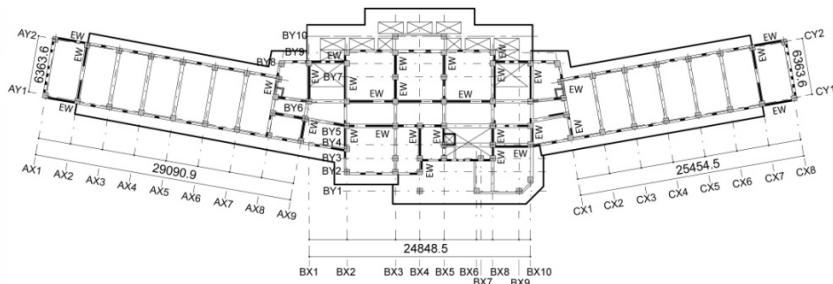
2nd floor framing plan (EW indicates seismic resisting walls).
